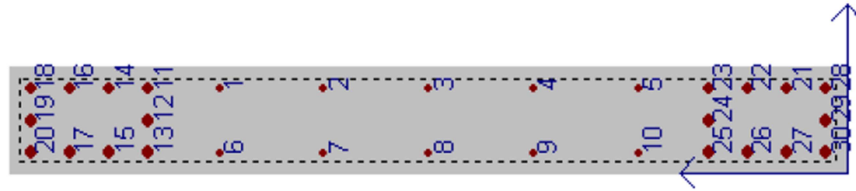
Wall 2 (companion) cross-section and reinforcement details
